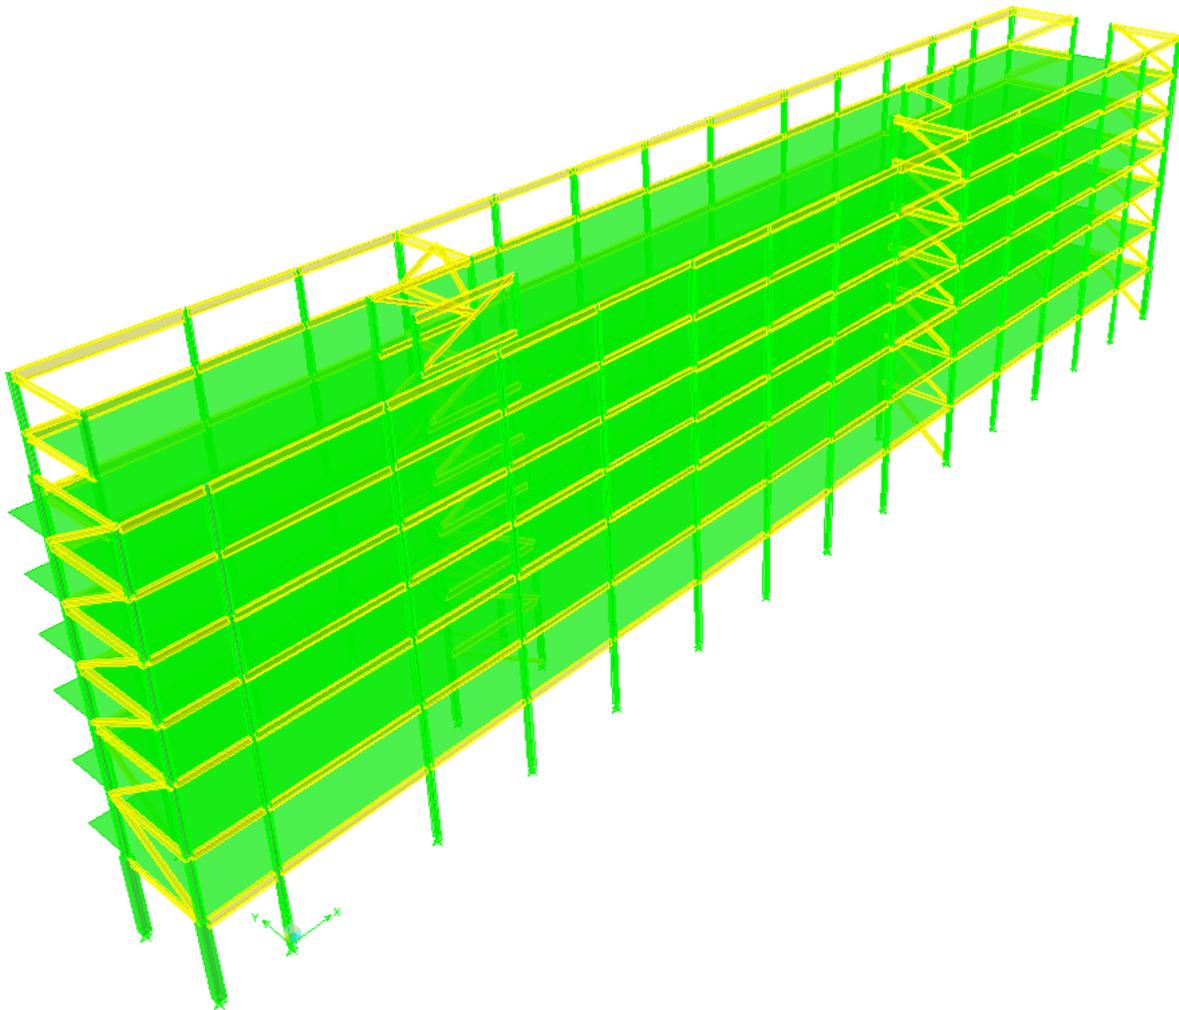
3D ETABS MODEL WITH EXPOSED SIXTH FLOOR SHOWING BRACED & MOMENT FRAME SYSTEMS
